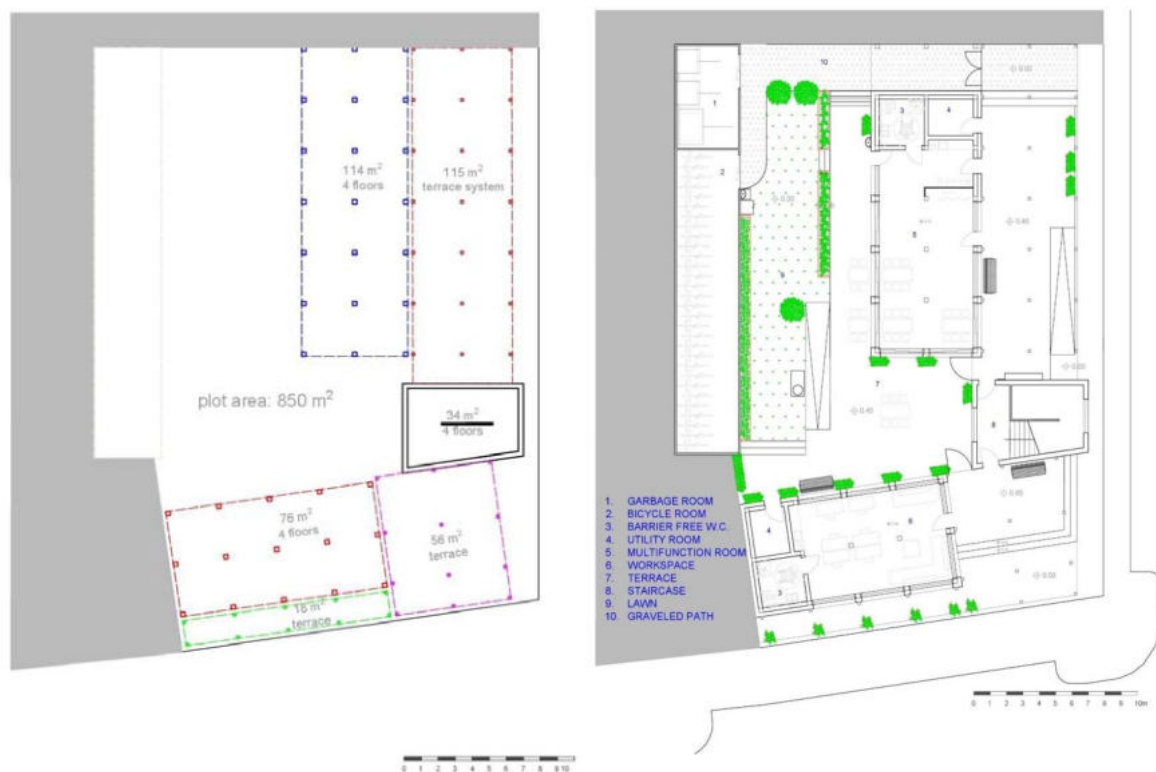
Gapsolutely fitting – Structural plan and ground floor plan<sup>47</sup>
